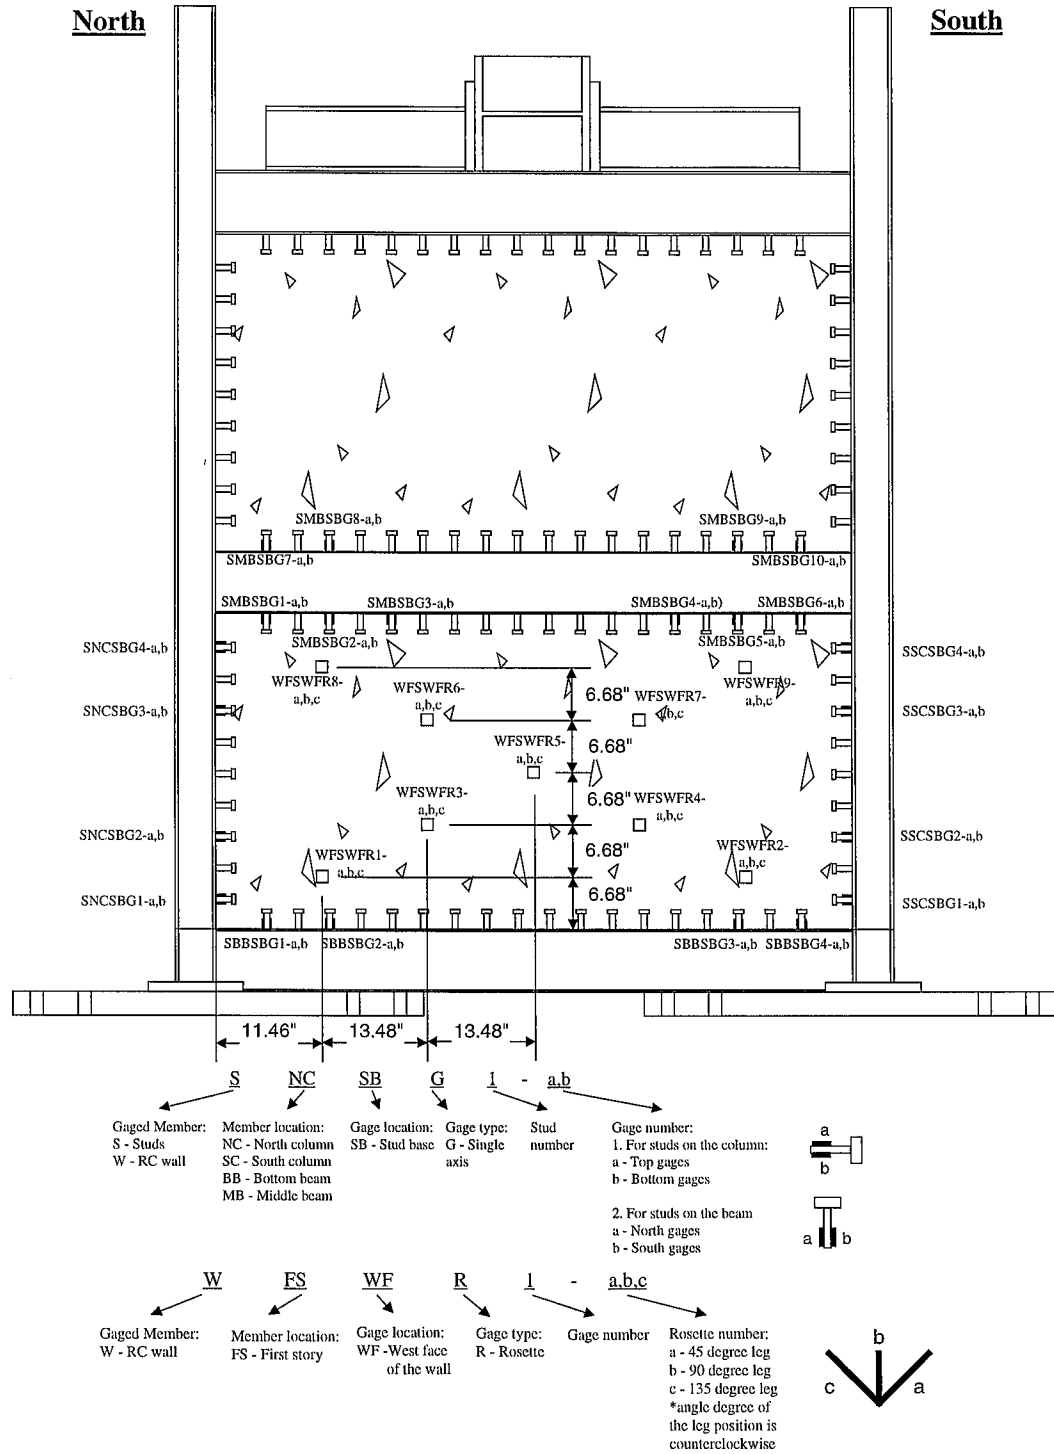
Instrumentation Plan: Strain Gages on the Studs and Infill Walls
